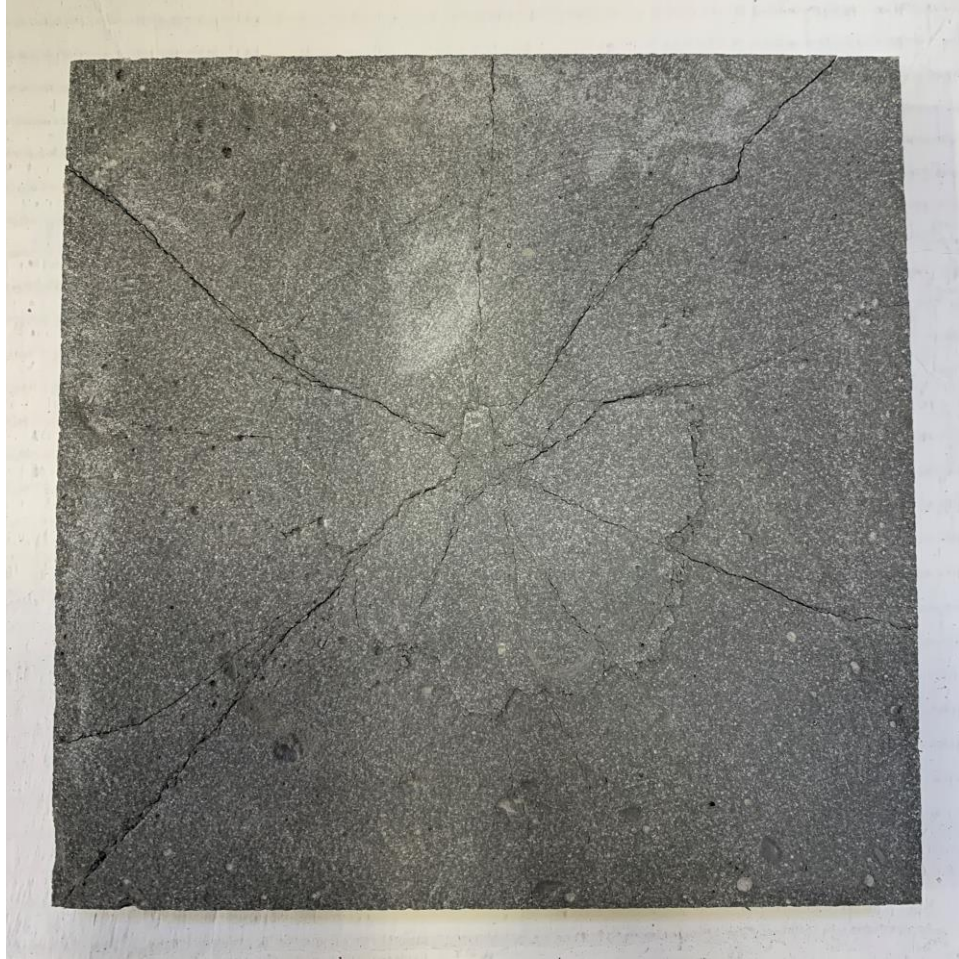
Typical cracking pattern on the rear face of UHPC core for a specimen manufactured with PETG neat resin.
